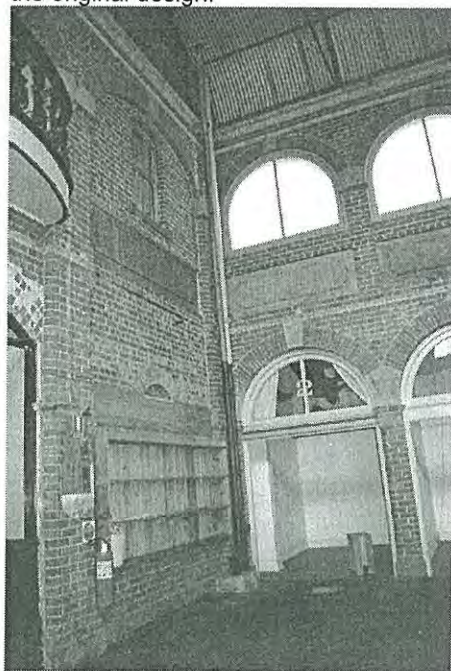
Interior, Exchange Hall (space H01). View of north-west corner showing introduced timber shelving over the round arched window on the west wall.
